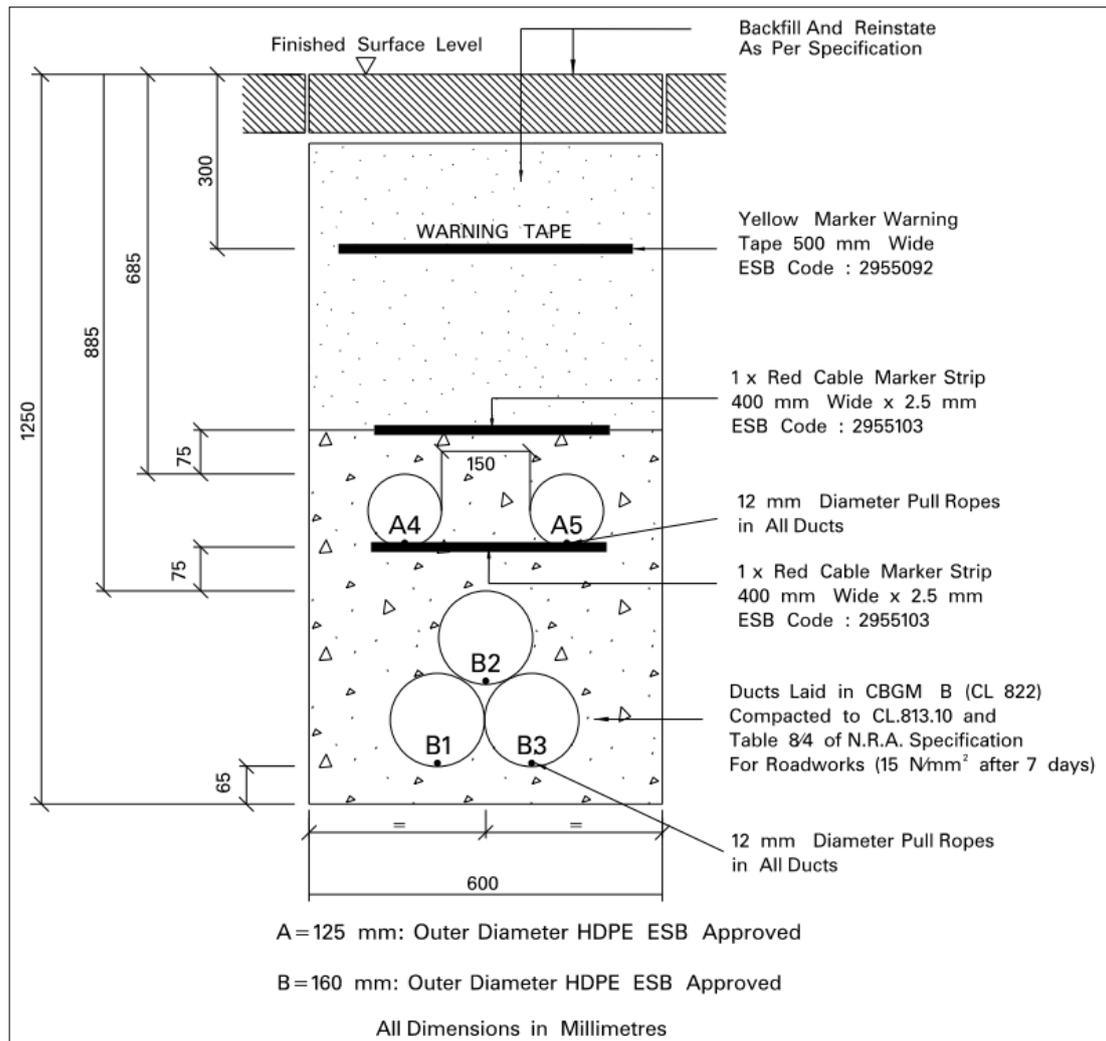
Typical Cross Section of Trench Trefoil Duct Arrangement for 110 kV underground cables
